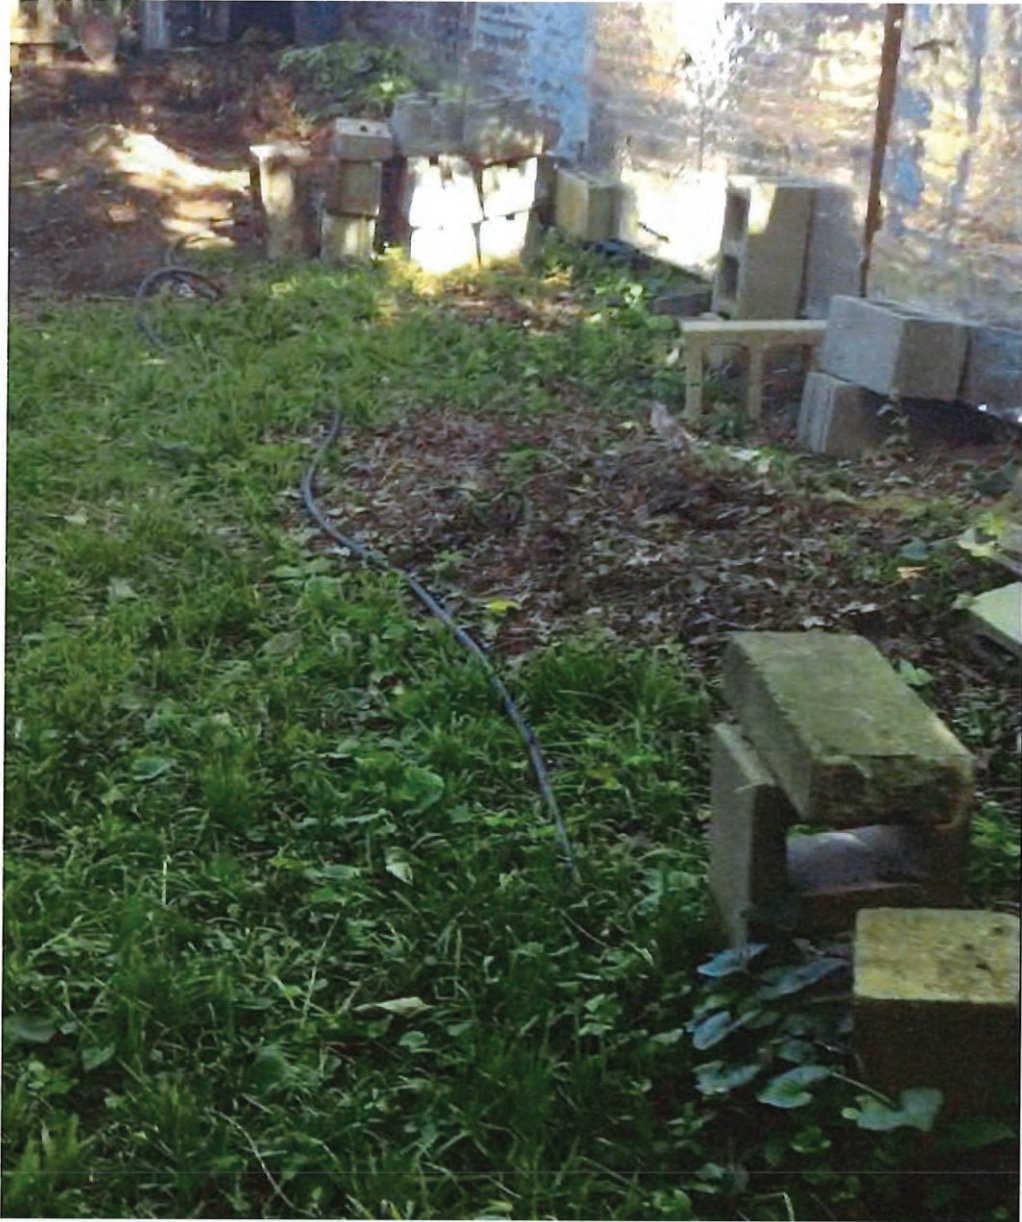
Outdoor storage of materials at 530 S. Washington Street on 06/23/2023.
